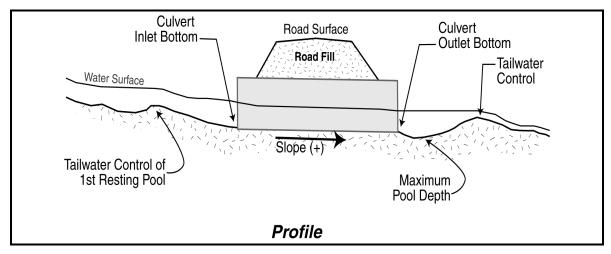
Diagram of required survey points through a culvert at a typical stream crossing (Taylor and Love, 2003).
